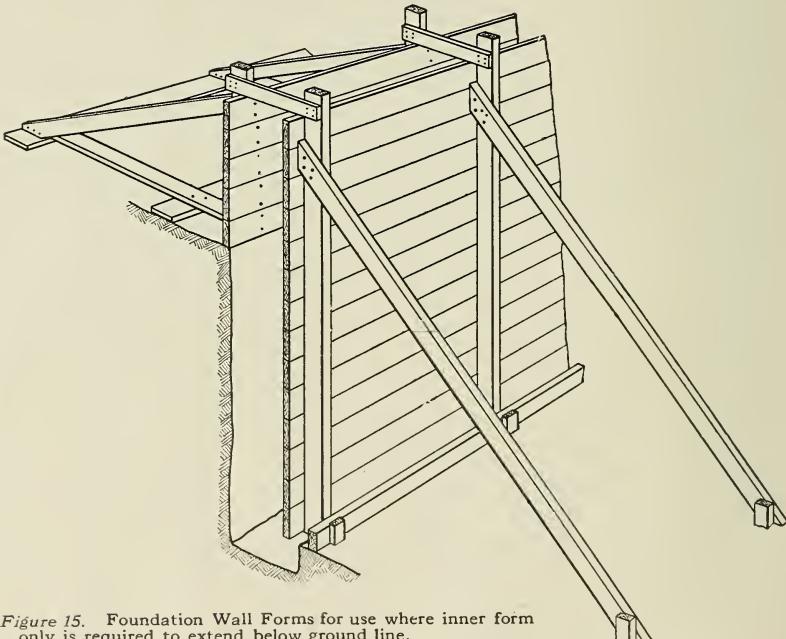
Foundation Wall Forms for use where inner form only is required to extend below ground line.
